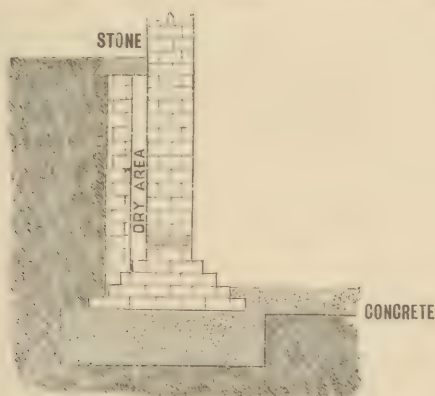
HOUSE FOUNDATION WITH DAMP-PROOF COURSE IN WALL AND DRY AREA.
